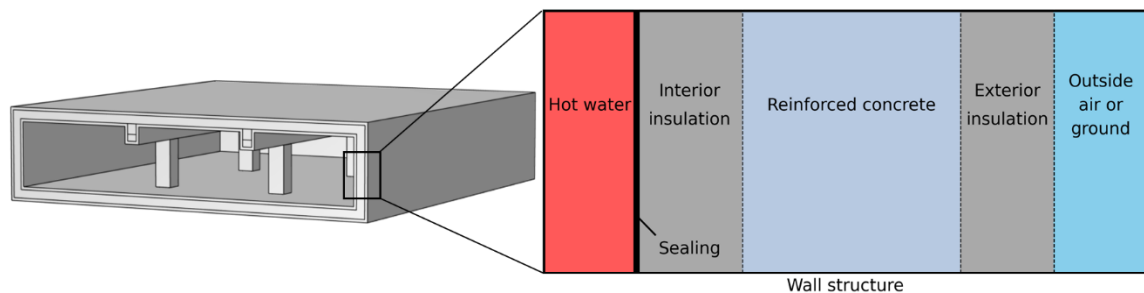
Left: Sectional view of the 3D model of the cellar, right: Wall structure after transformation from concrete wall to heat storage [Source: Own illustration]
